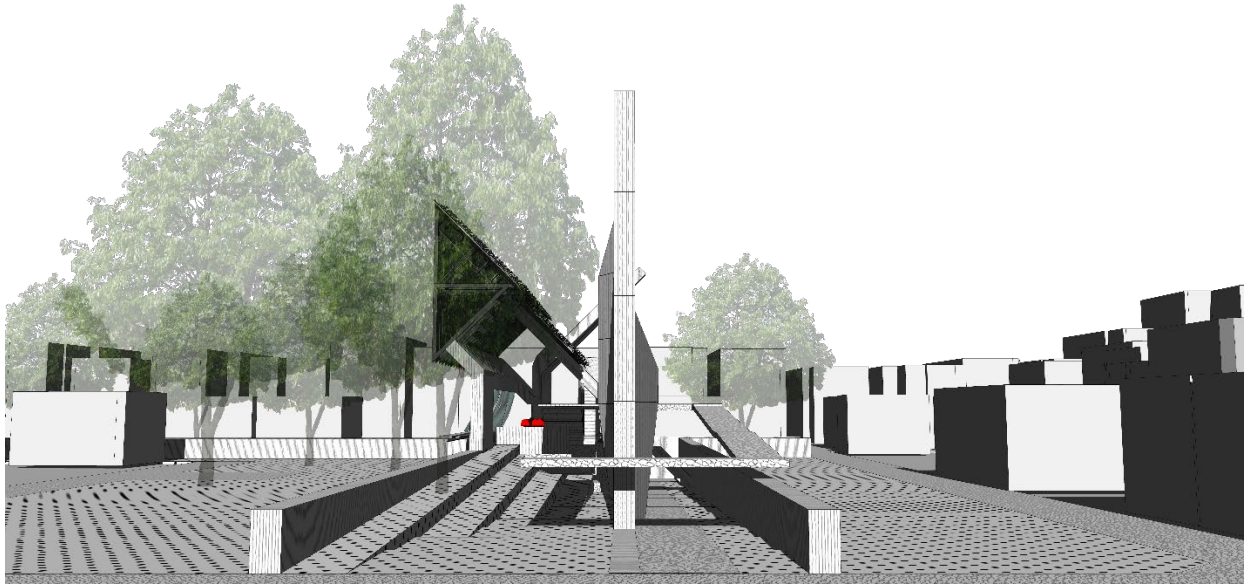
Hideaway Park Folly: Traversing Ramp at west elevation, by Author
